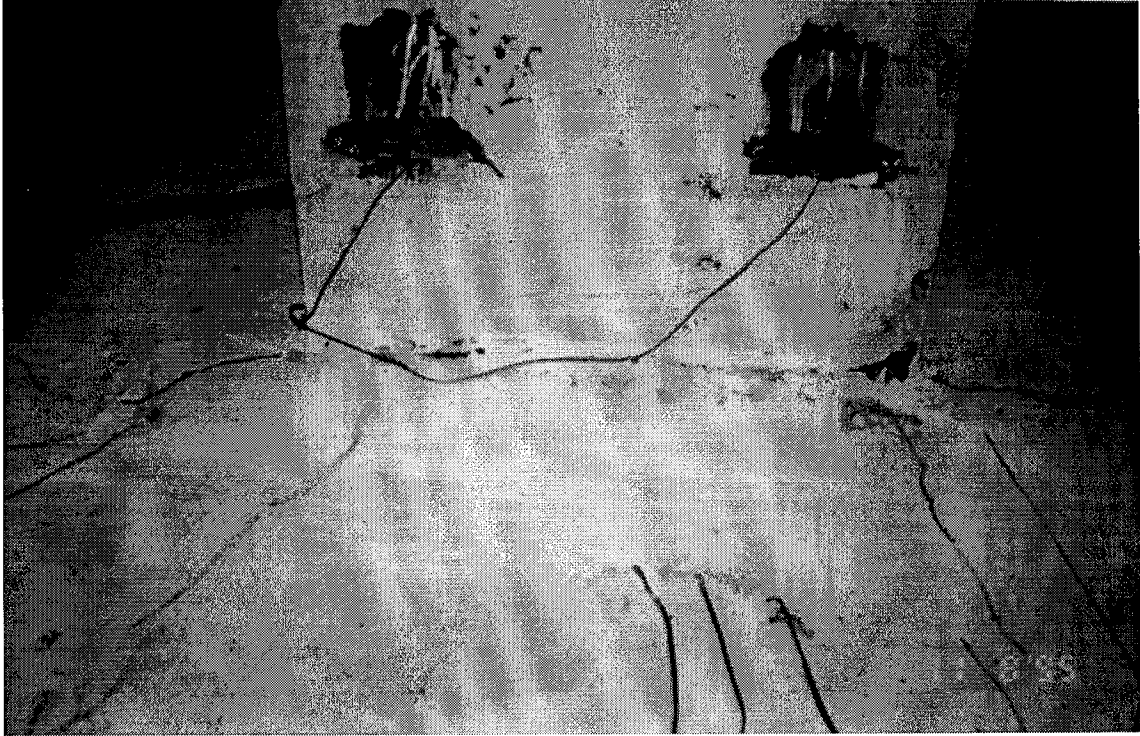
Top View of Concrete Slab-Column Interface (East Girder of Specimen 2)
